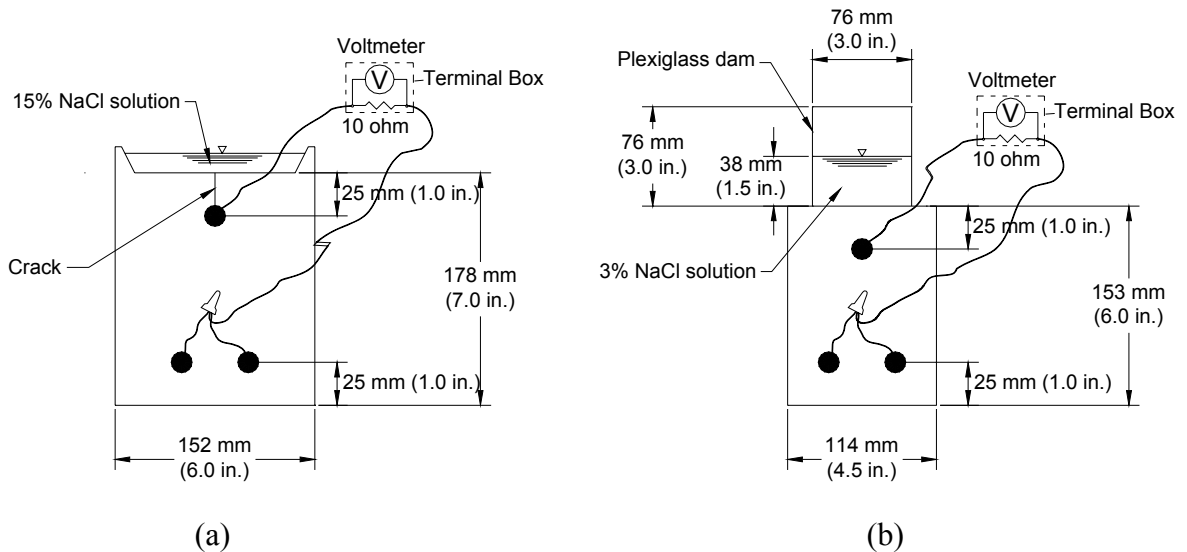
(a) Cracked beam specimen and (b) ASTM G 109 specimen
